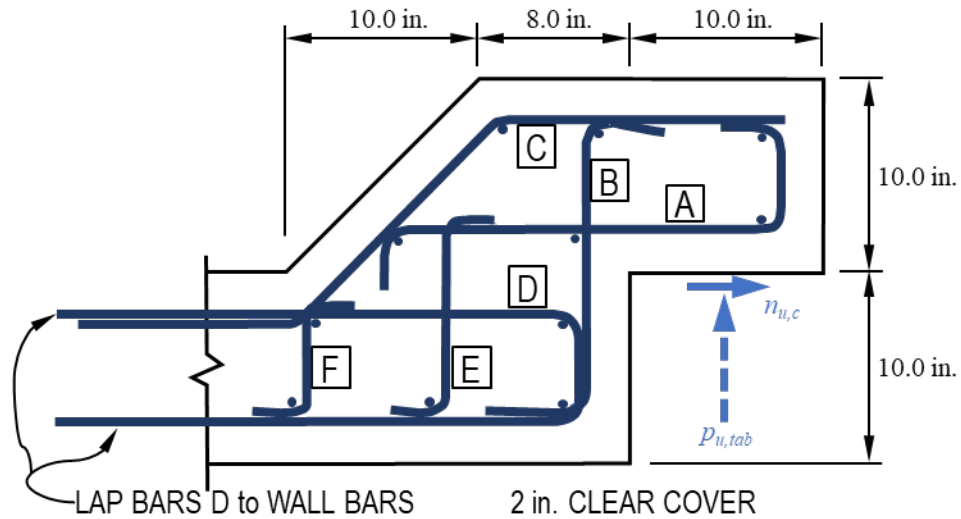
Potential wall tab geometry and reinforcement configuration
